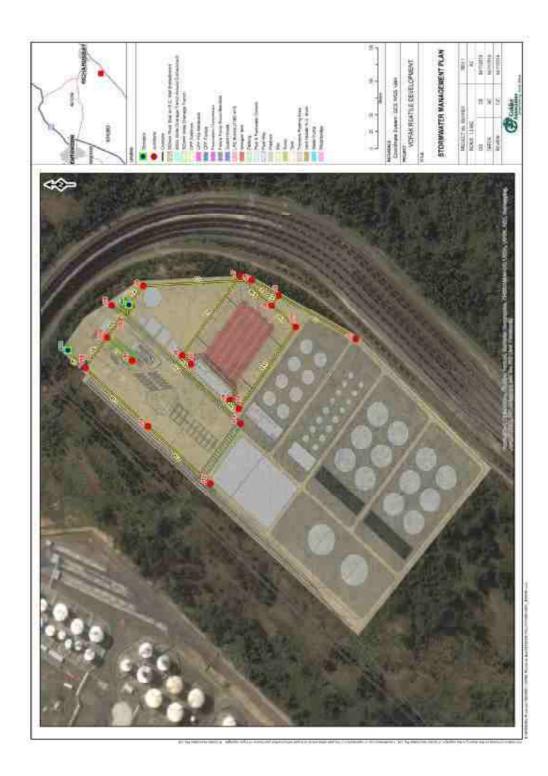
Stormwater management plan layout for Vopak-Reatile Terminal
